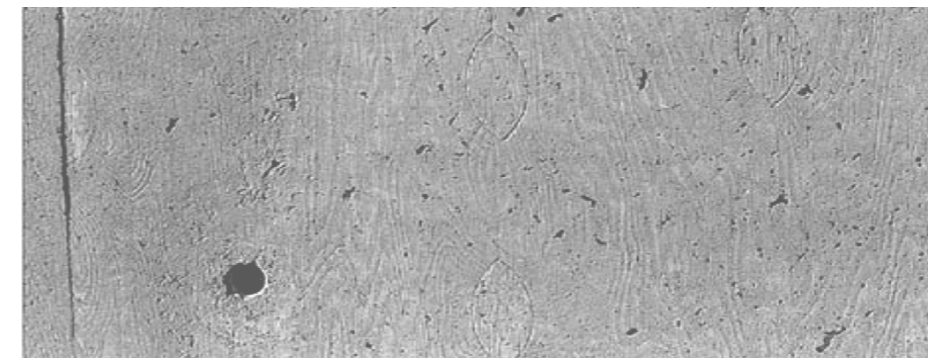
Concrete finish, rough sawn timber sheeting used for formwork
